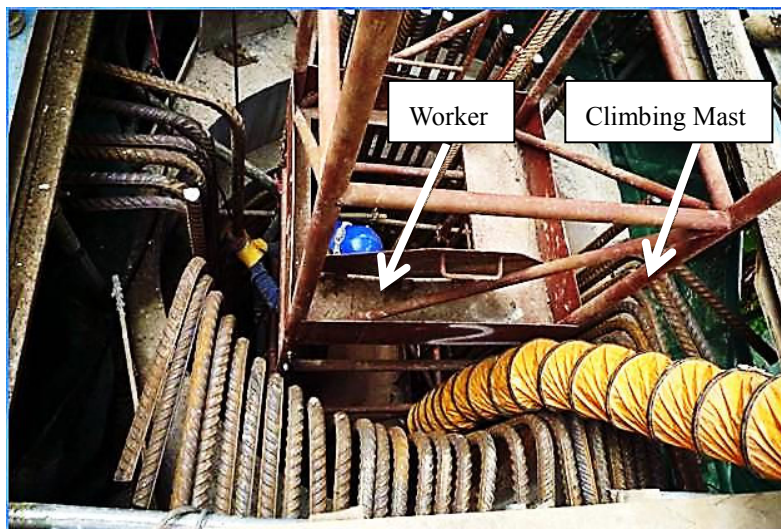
A worker inside the climbing mast during reinforcement bars fixing
